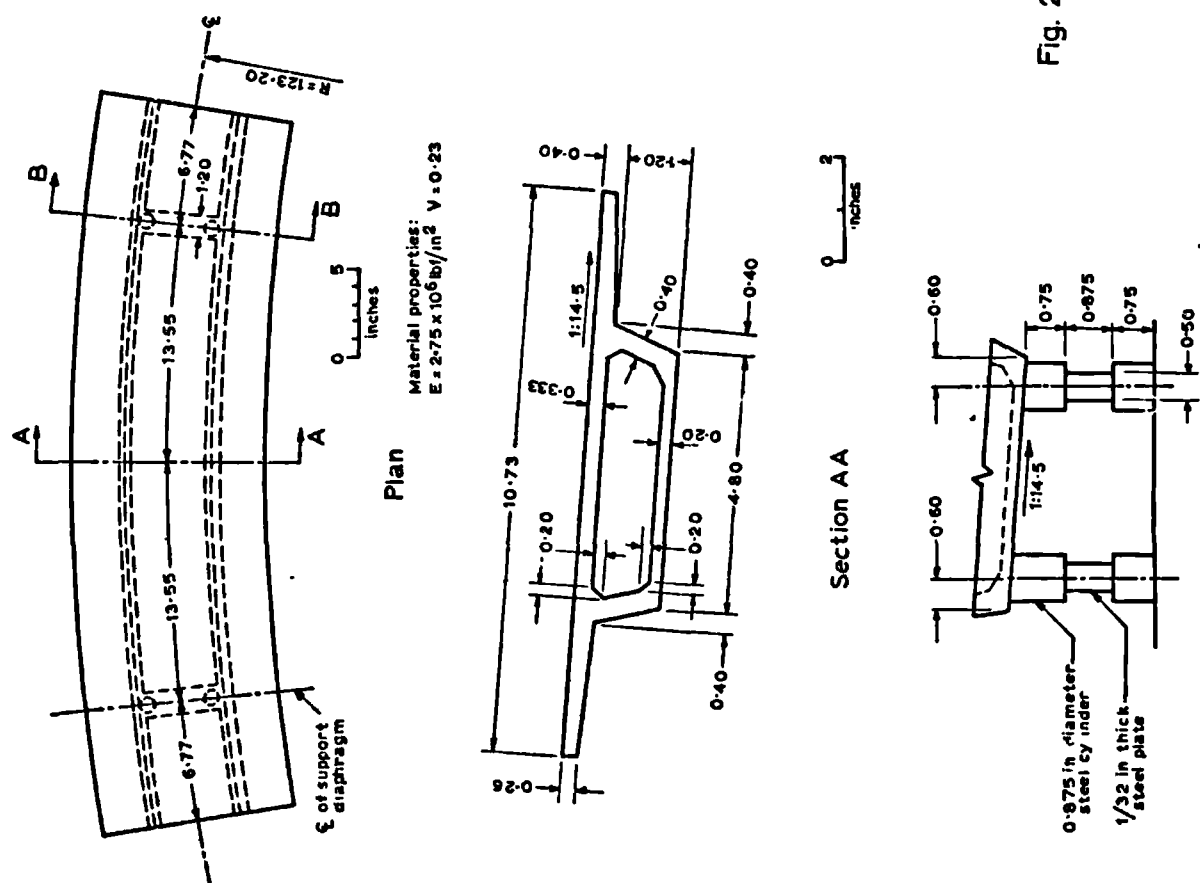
Curved single cell box girder bridge model. Details of model and loading
